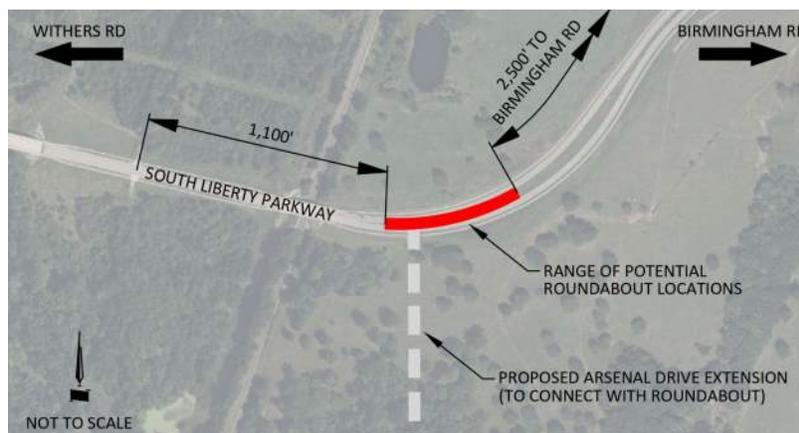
Potential Roundabout Locations In Western Portion of Corridor
